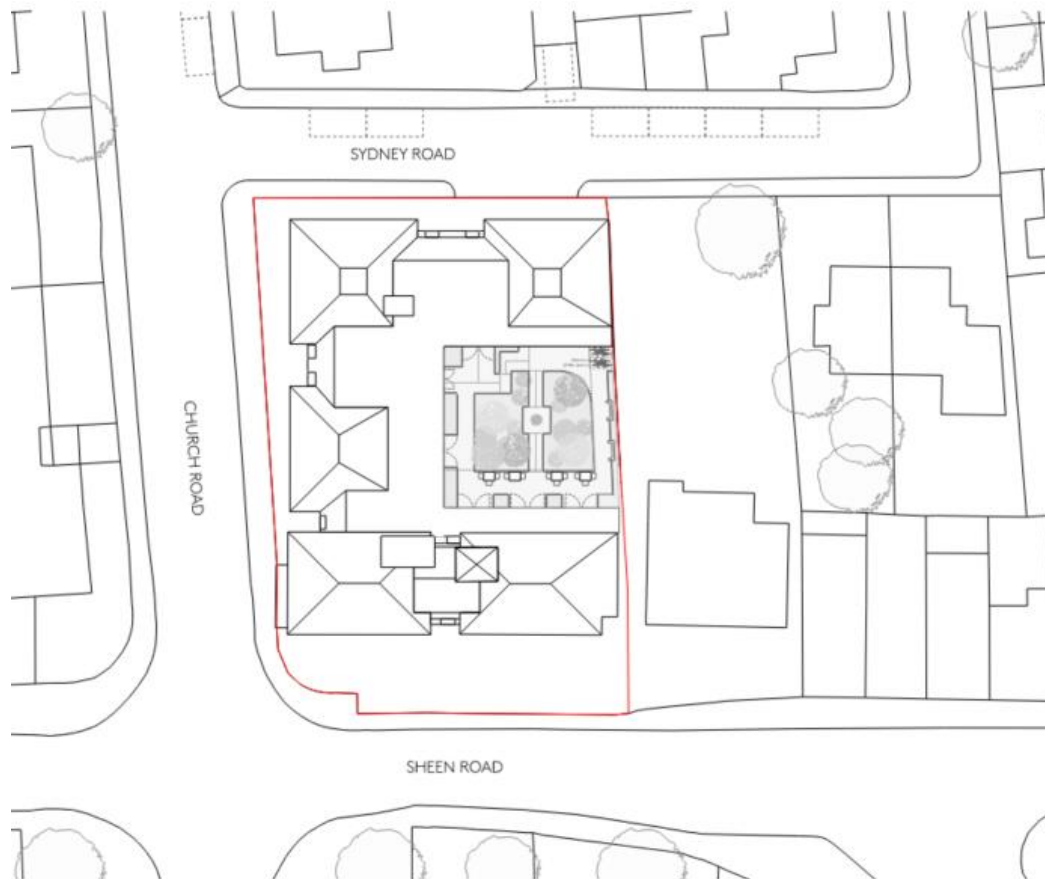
Site layout showing the location of the proposed Richmond Inn development. The site boundary is shown in red.
